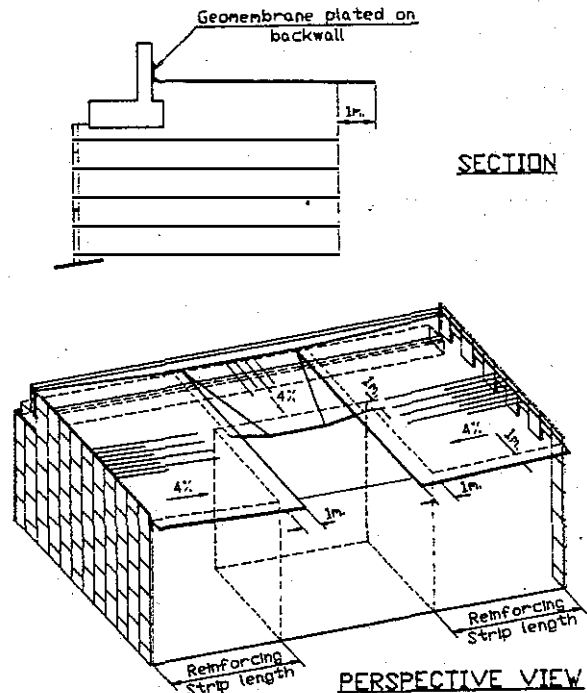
Waterproofing of a Reinforced Earth abutment and return walls
